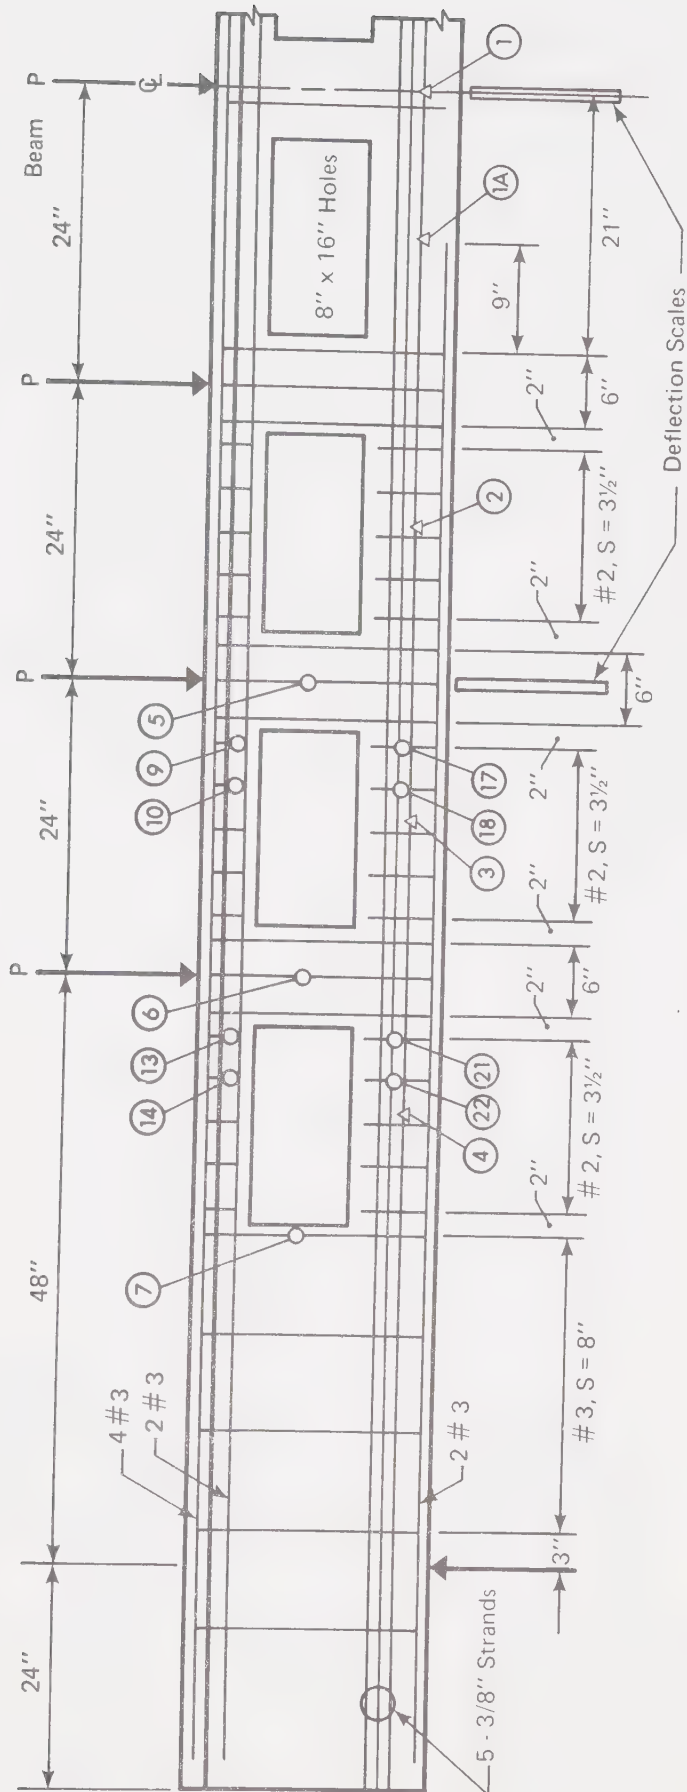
Reinforcement Details and Strain Gage Locations for Beam 9-16-7L
